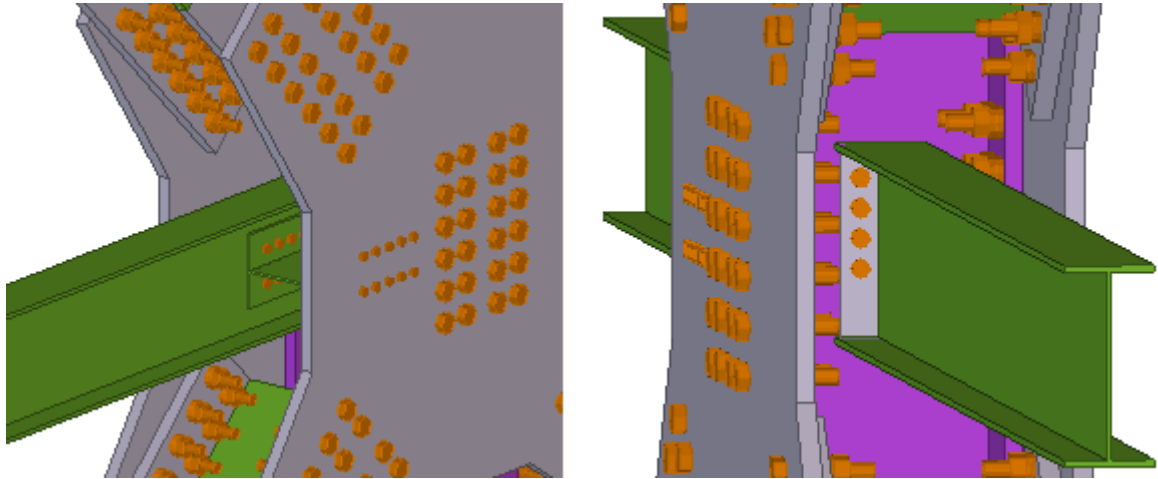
Connection CON1 modified to fit multiple beams and braces.
